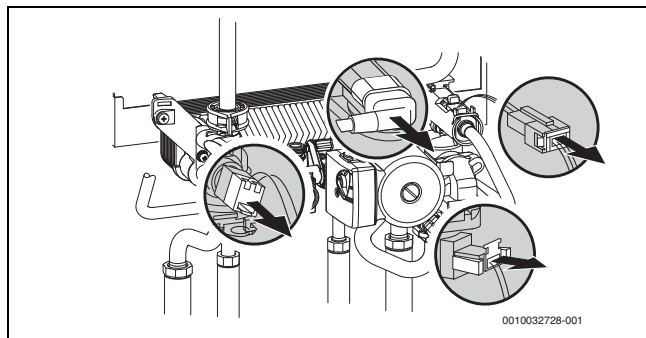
Unplugging electrical connections / removing hose from safety relief valve
